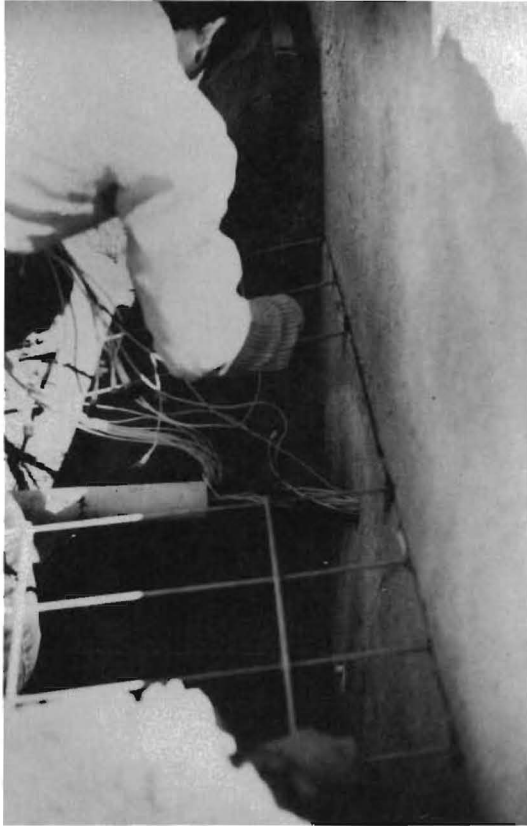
A 2 in. diameter hole was cored through the 11 in. thick concrete wall facing element to permit the sensor leads to be passed through the wall.
